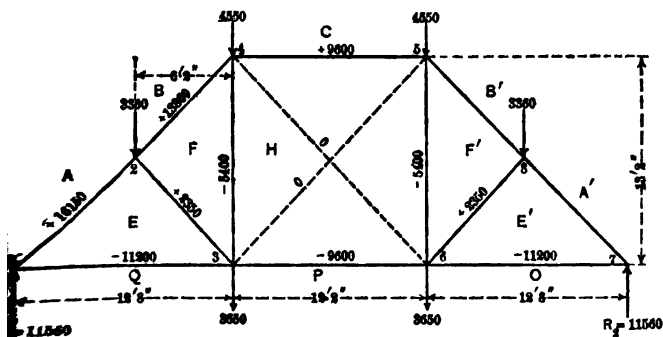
Queen Truss. Truss-diagram. (See, also, Figs. 3, 12 and 54 and Chapter XXVIII, Fig. 1)
